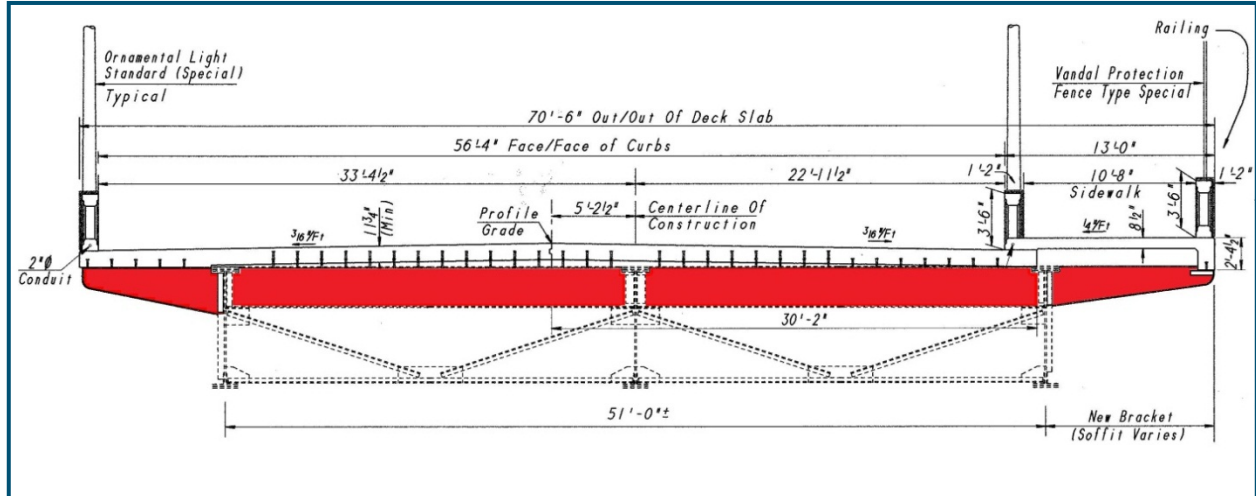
Transverse deck section showing typical NSTM floorbeam elevation in girder spans.
